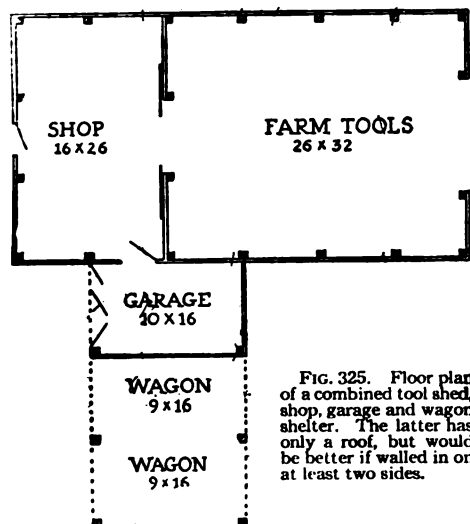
Floor plan of a combined tool shed, shop, garage and wagon shelter. The latter has only a roof, but would be better if walled in on at least two sides.
